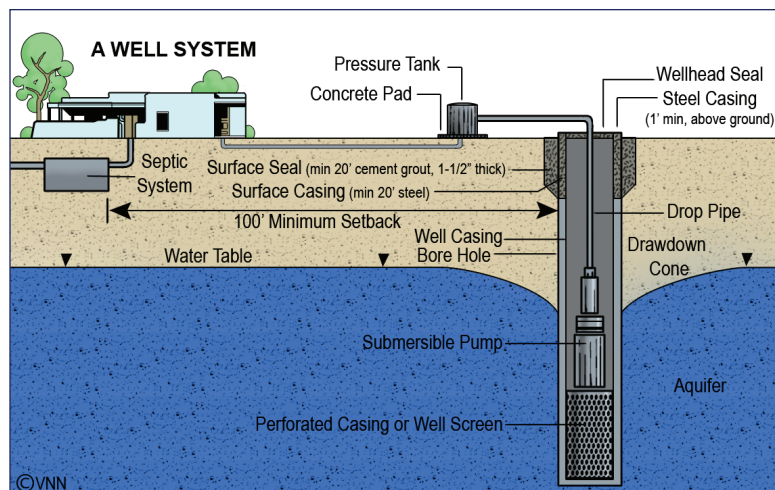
Minimum well construction standards are administered by the Arizona Department of Water Resources (ADWR) to protect the aquifer and well from surface water ponding around the well head.
